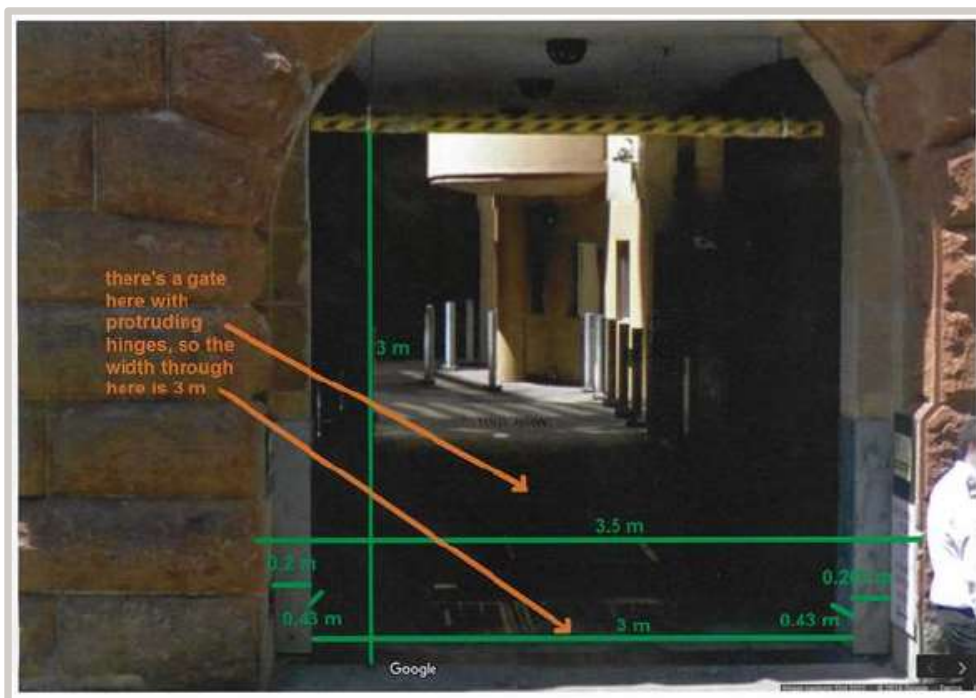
Existing Loftus Street Entry (Source: Loading Dock Management Plan prepared by ARUP)
